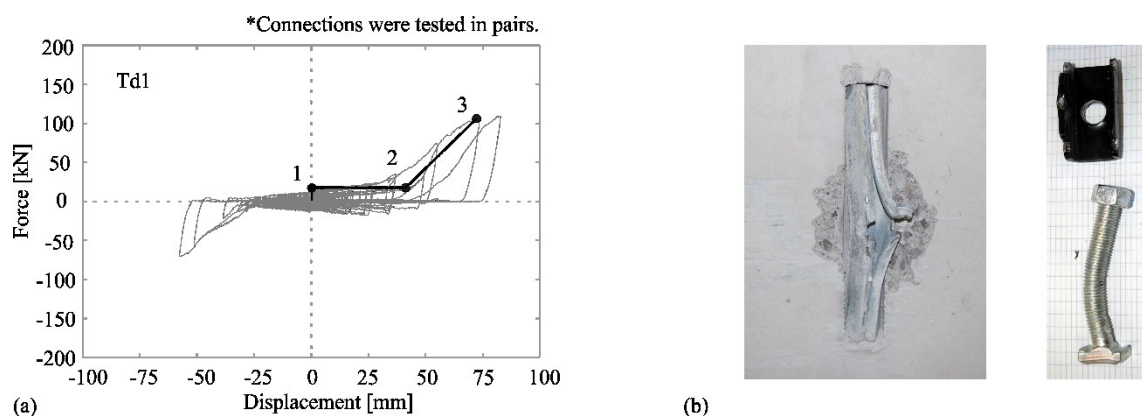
Test of the top bolted connections: (a) typical hysteretic response of the top connections, (b) failure of the channel and deformed bolt
